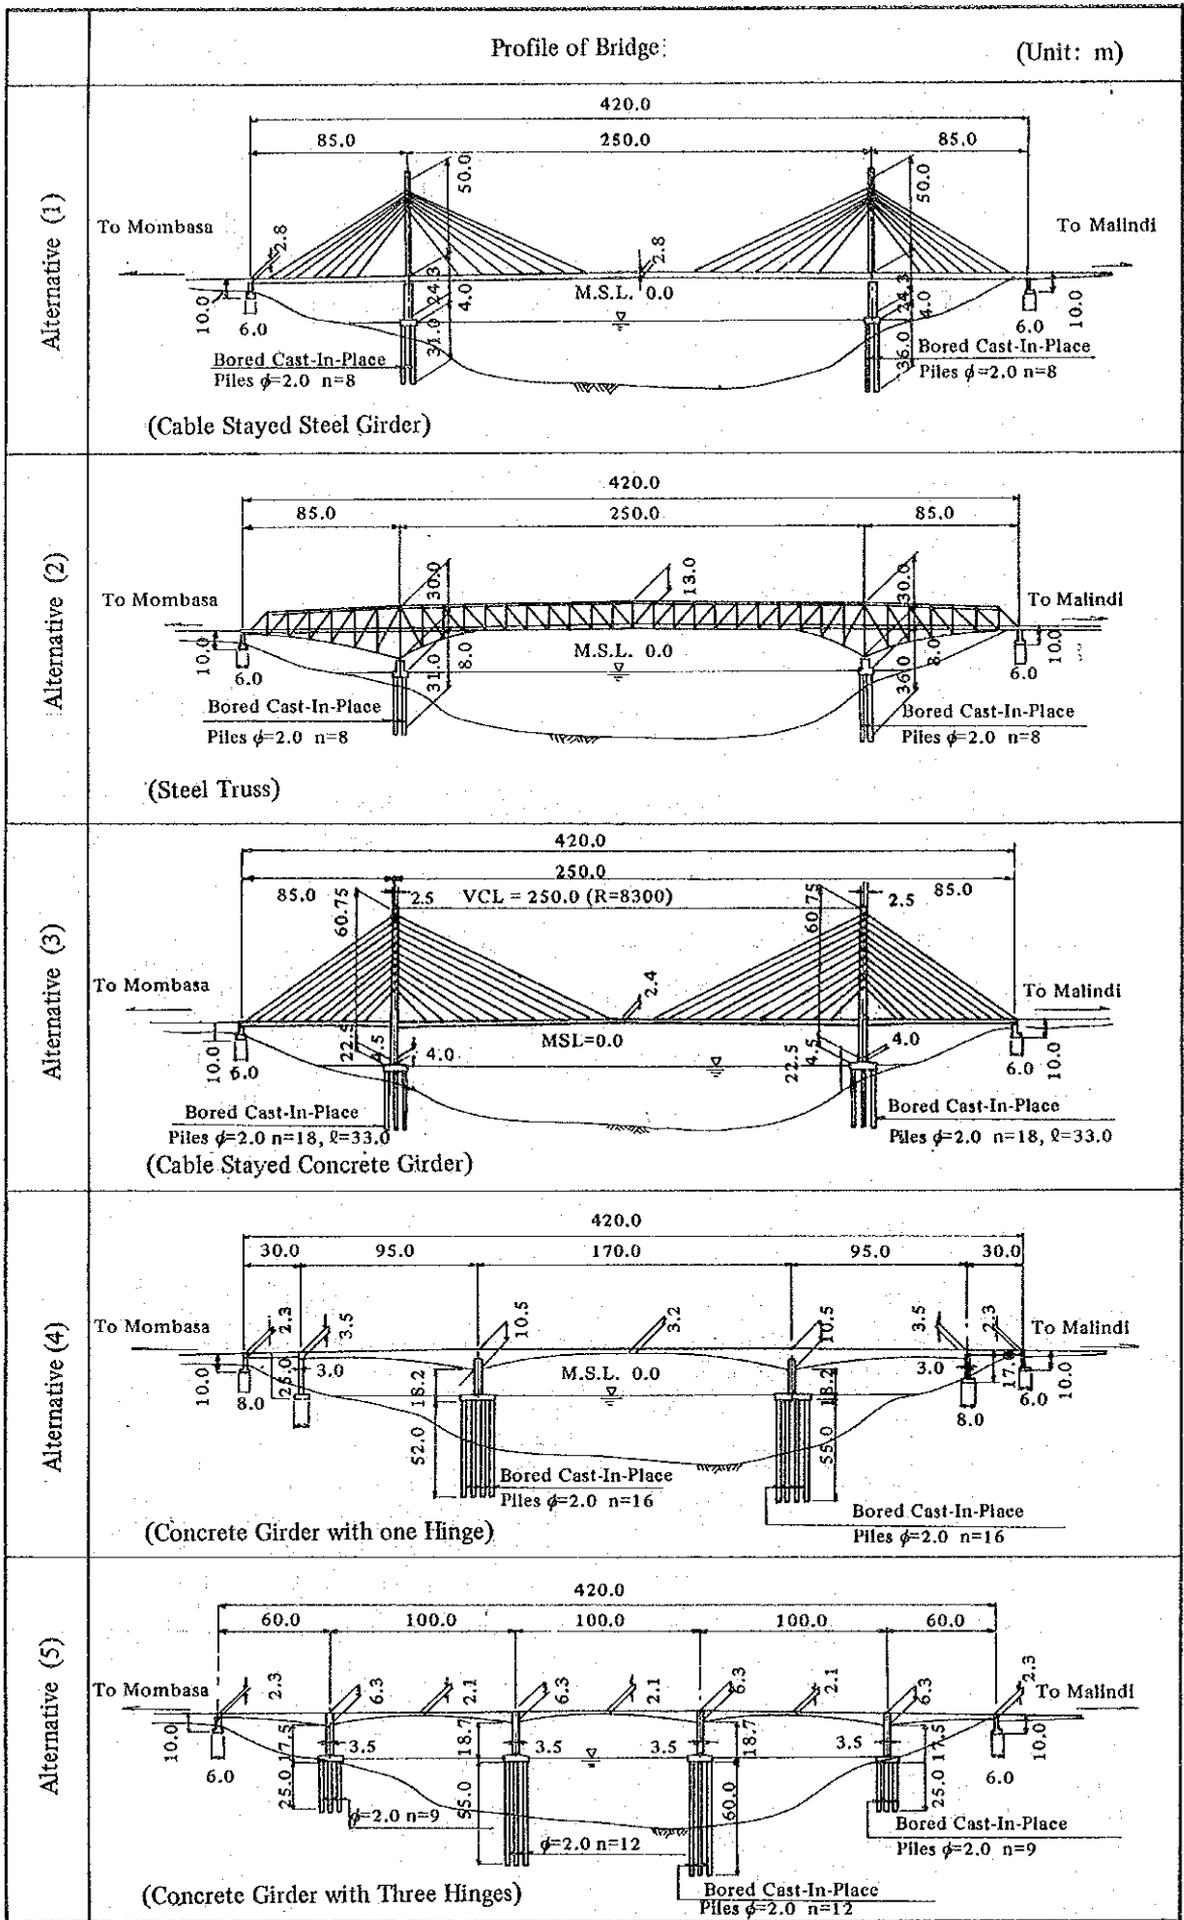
ALTERNATIVE BRIDGE PLAN
